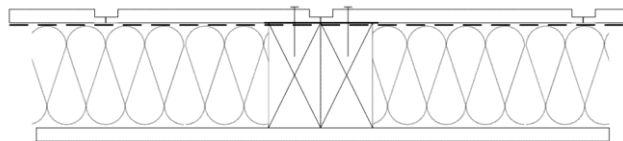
Hardboard sheet cladding Vertical Butt Joint (unpainted only)
